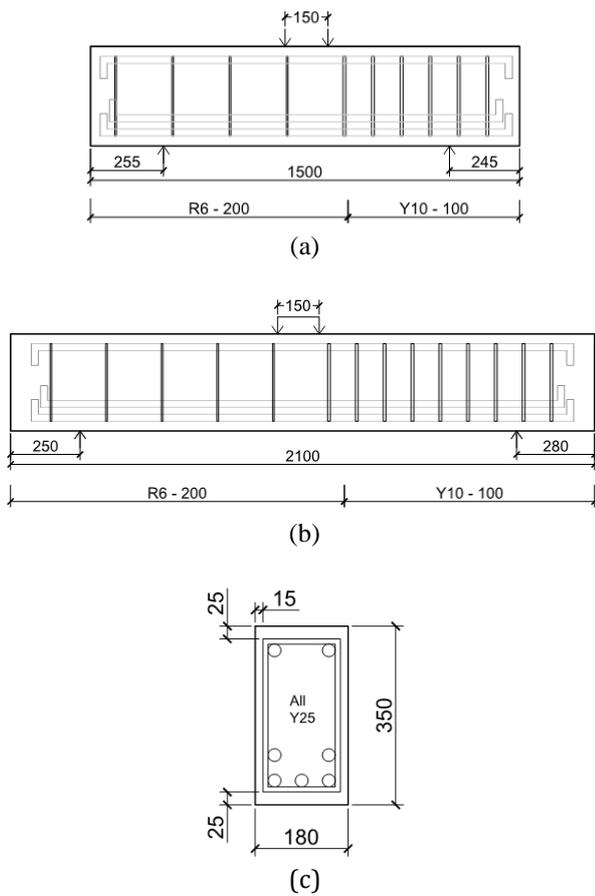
RC beam details (Unit: mm): (a) Group A, S/D=1.5:1, (b) Group B, S/D=2.5:1, (c) Section view
